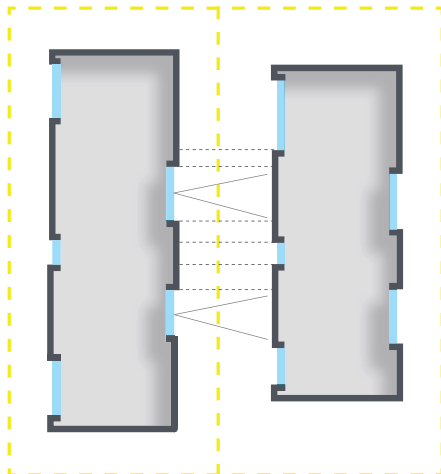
WINDOWS AND SIDE ELEVATIONS
